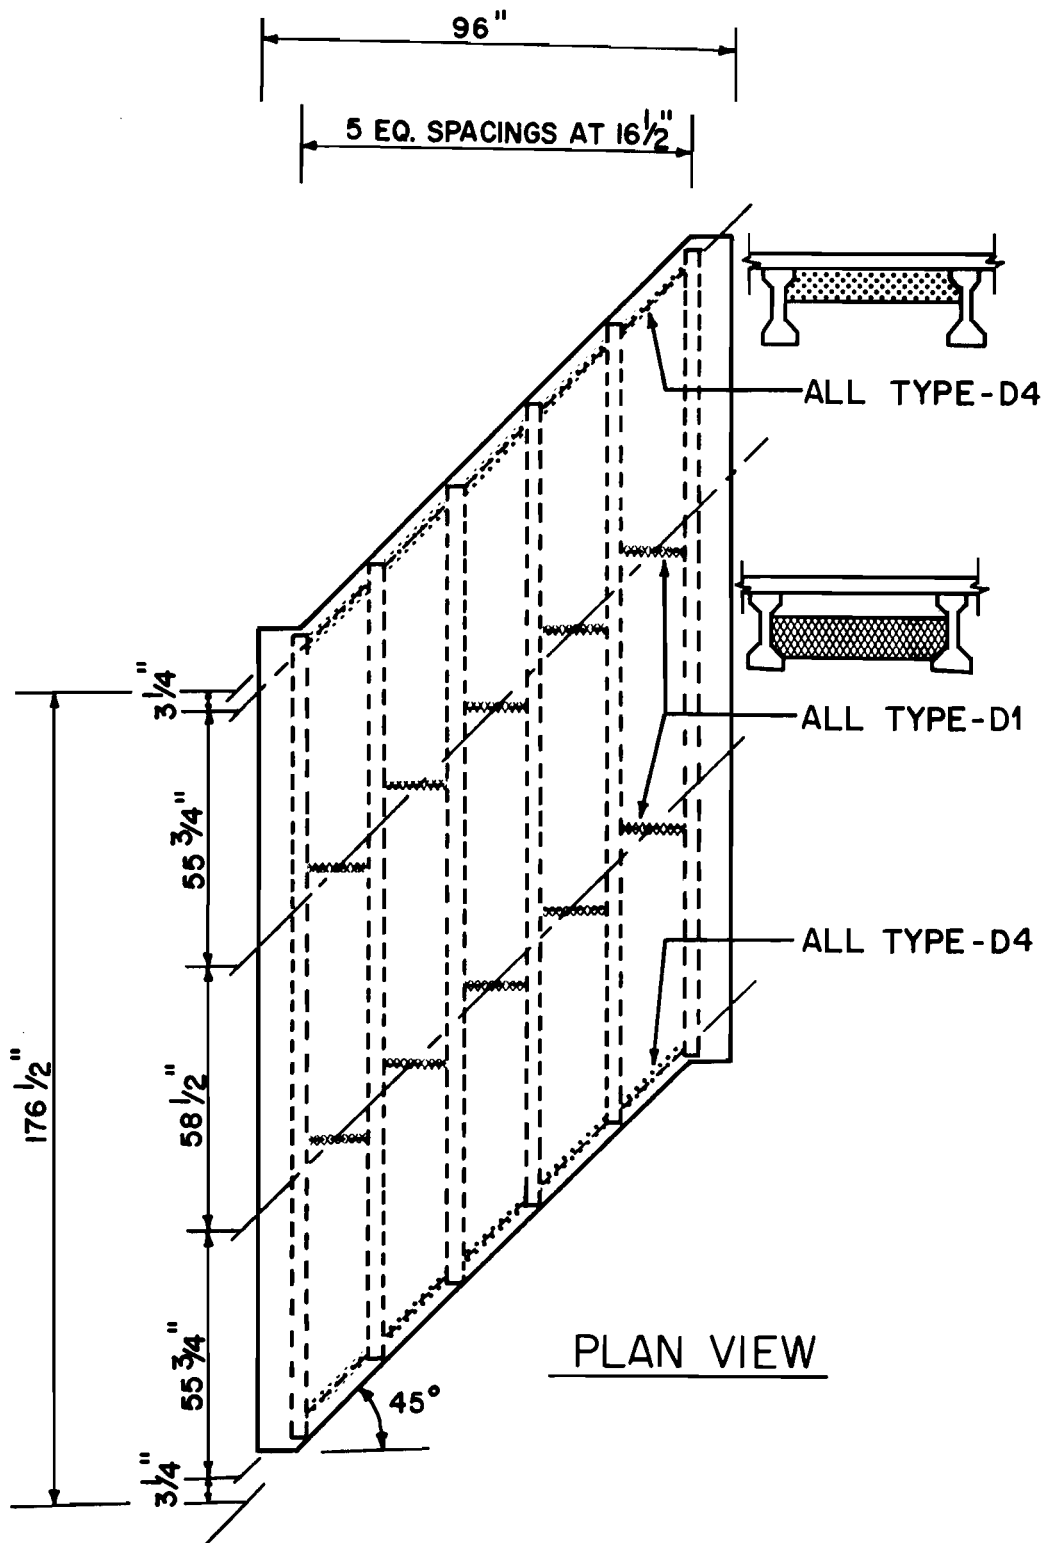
Bridge 1, general plan, diaphragm types and locations.
